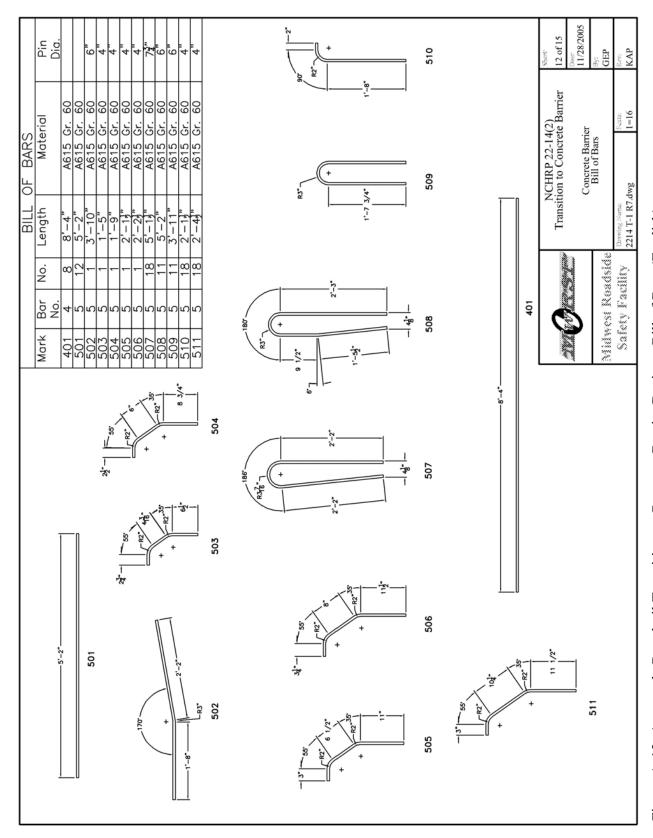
Approach Guardrail Transition to Concrete Barrier Design - Bill of Bars (English)
